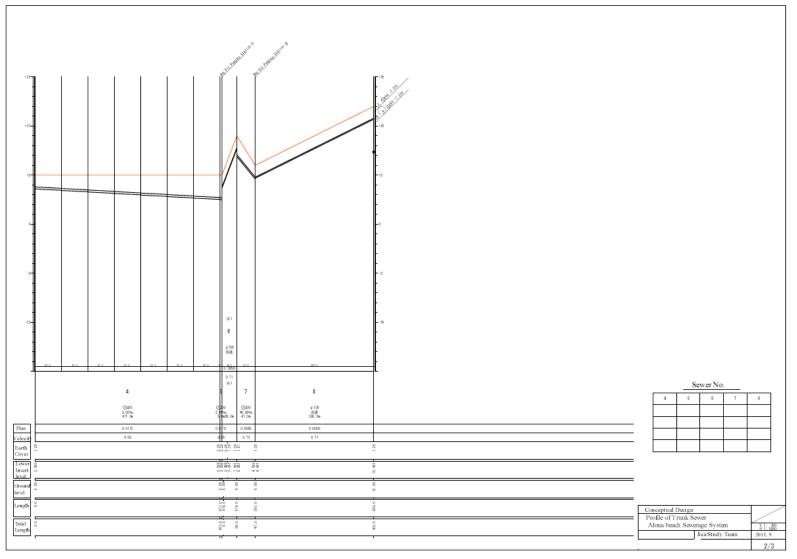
Profile of Trunk Sewer (Alona Beach Sewerage System)
